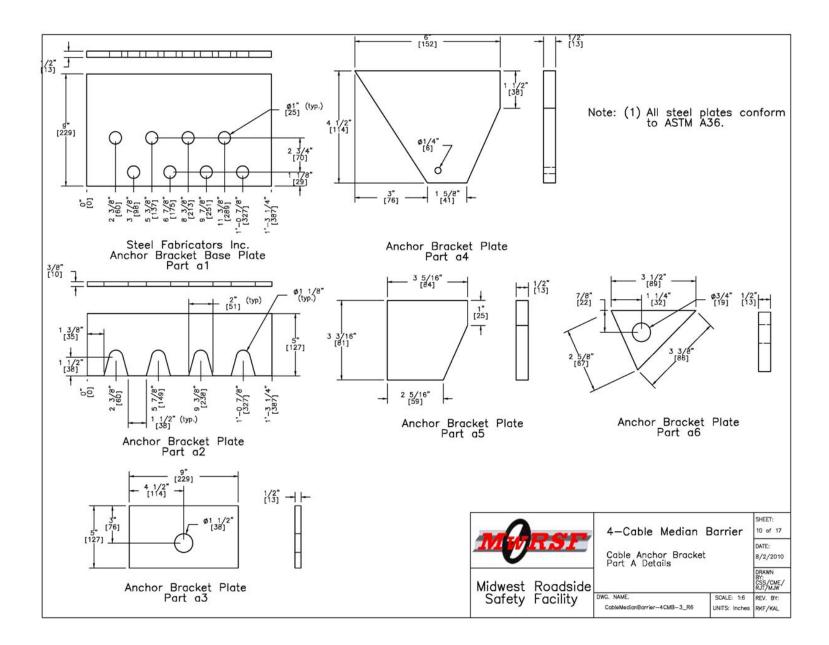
Cable Anchor Bracket Details, Test No. 4CMB-3
